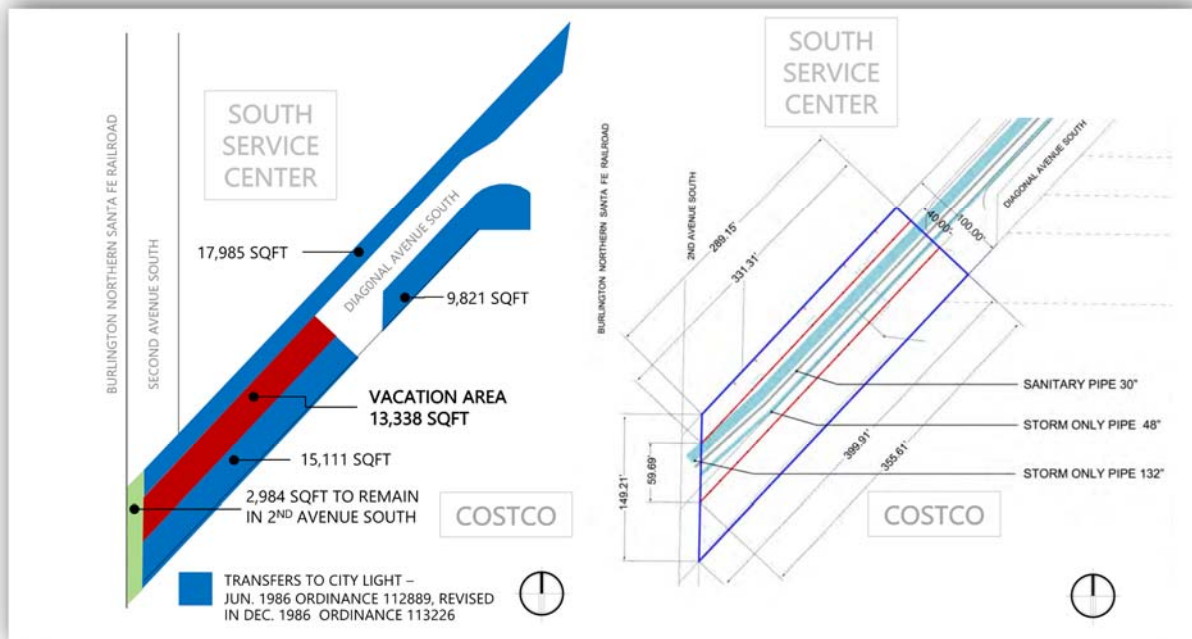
Vacation site details and dimensions. Underground utilities are shown.
